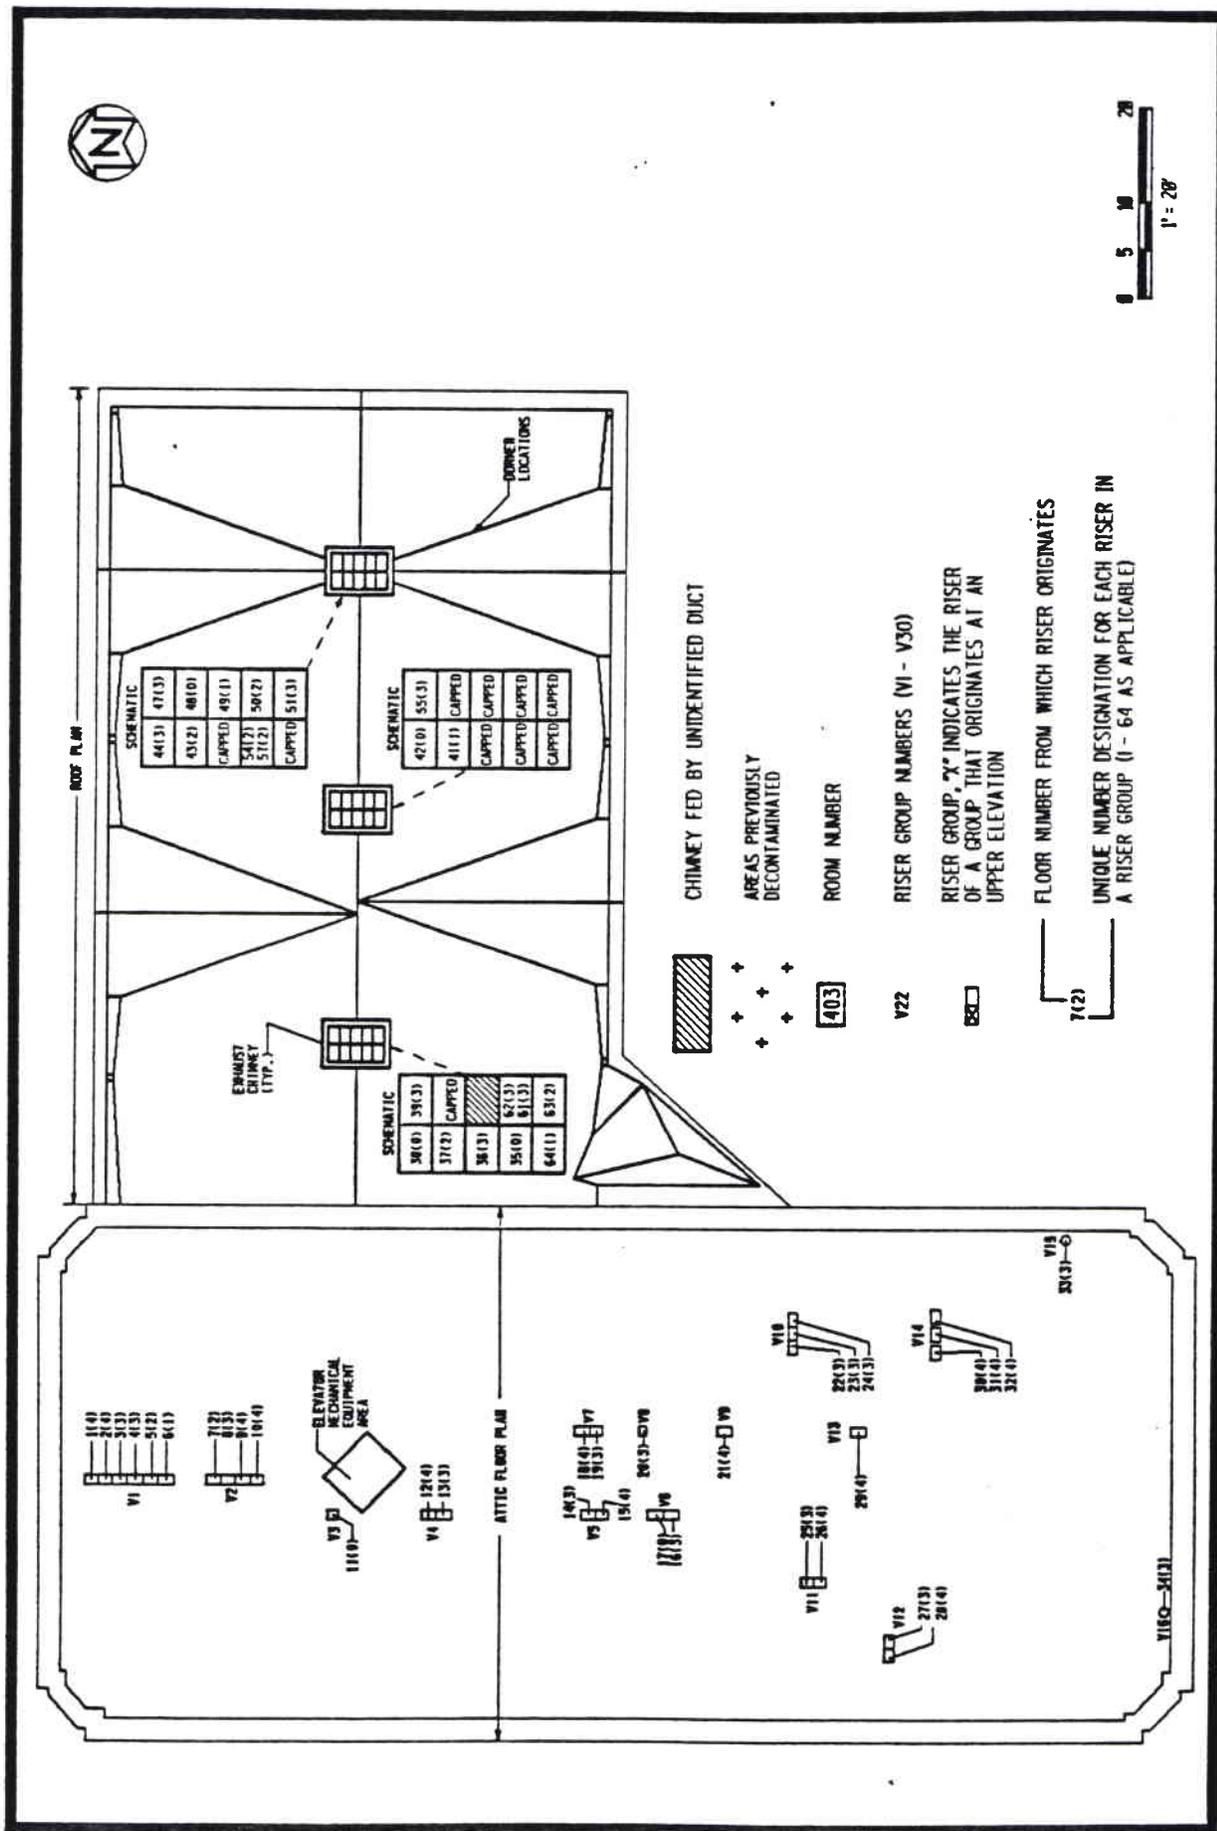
FLOOR PLAN OF THE ATTIC
